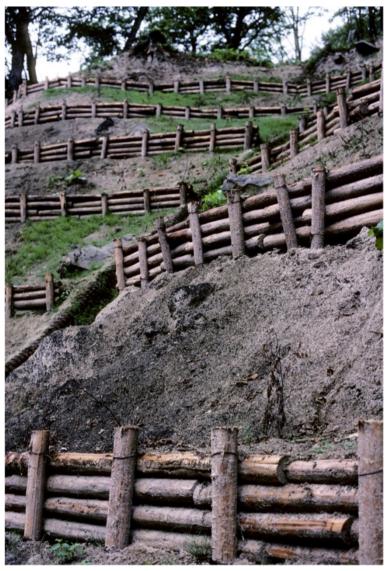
Example of slope stabilization. Timber retaining walls used to stabilize a steep slope in a volcanic area in Japan (USGS photo by TCP).
